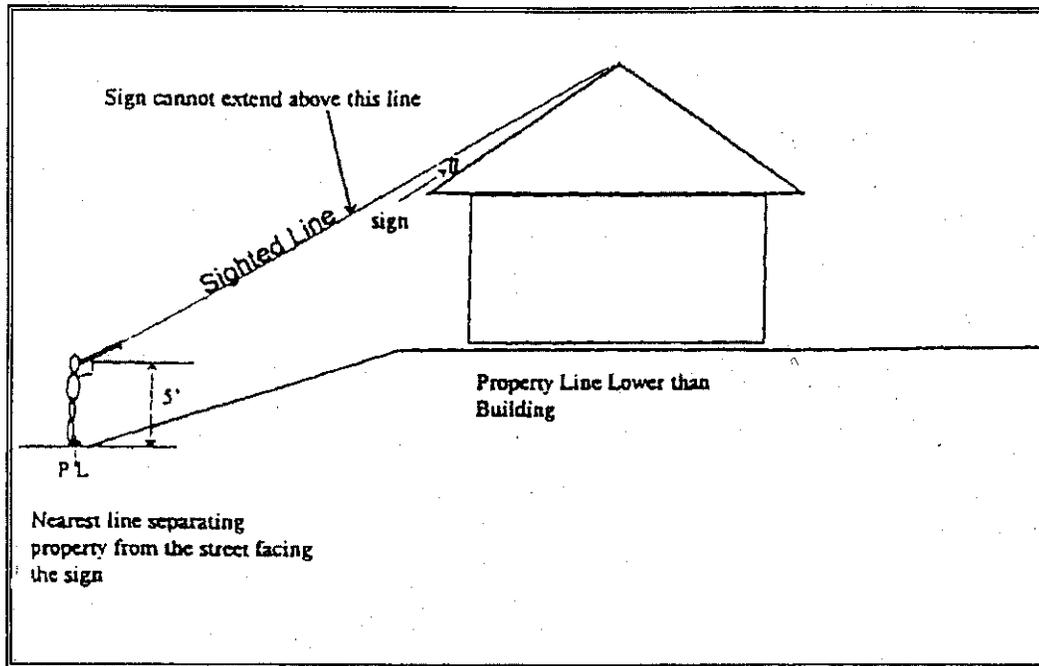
Figure B (cont'd.)—Typical Height of Sign on Roofing Examples
